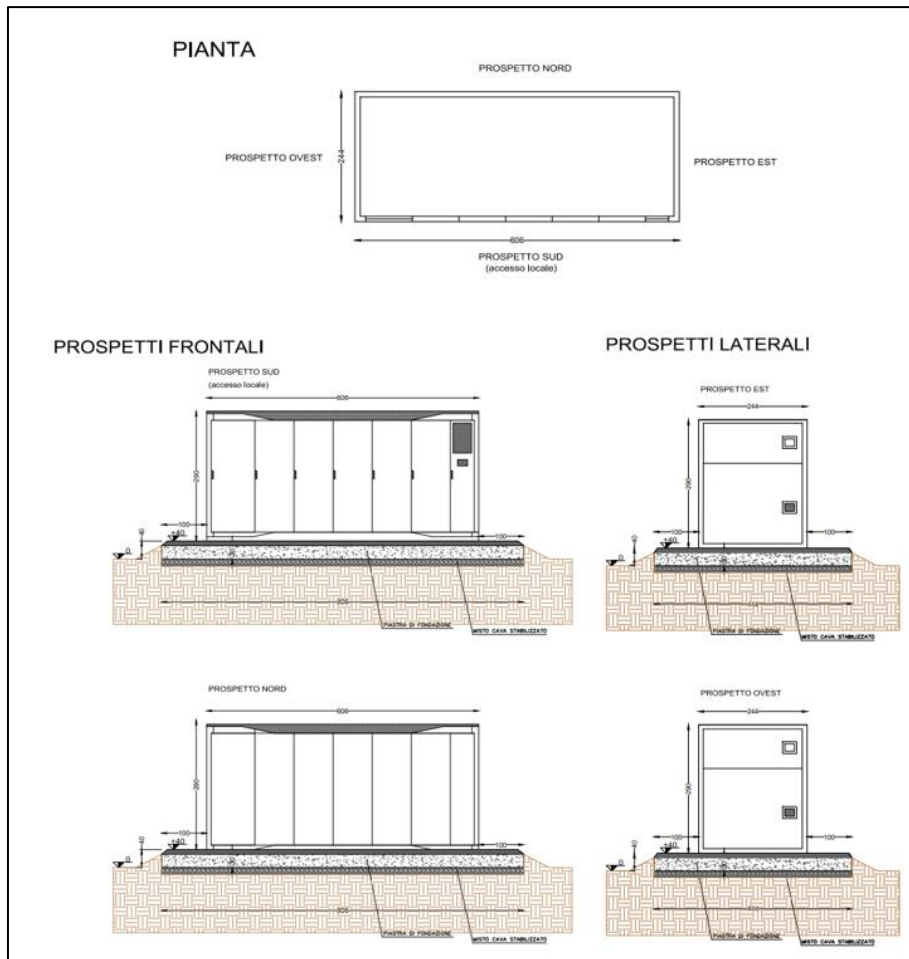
Extract of table “Detail of the storage room (plans and elevations)”
